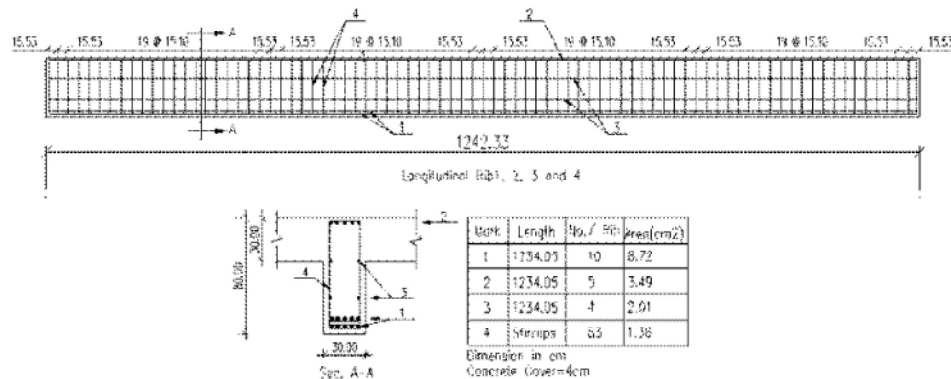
Details of steel reinforcement for longitudinal ribs in model No. 2.
